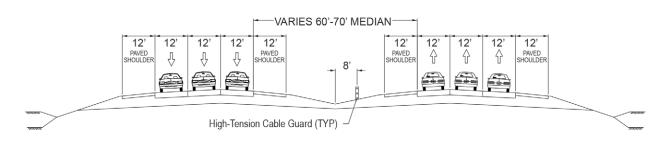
I-43 Mainline North Segment Typical Section: Modernization – 6 Lanes
